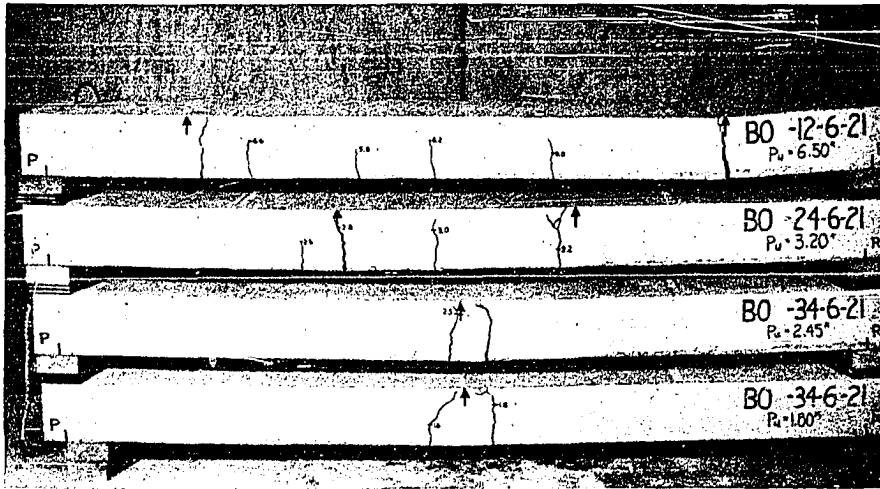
Typical shear-bond failures of beams constructed with deck O-20 gage. Each beam was 12 inches wide and 6 feet in length
